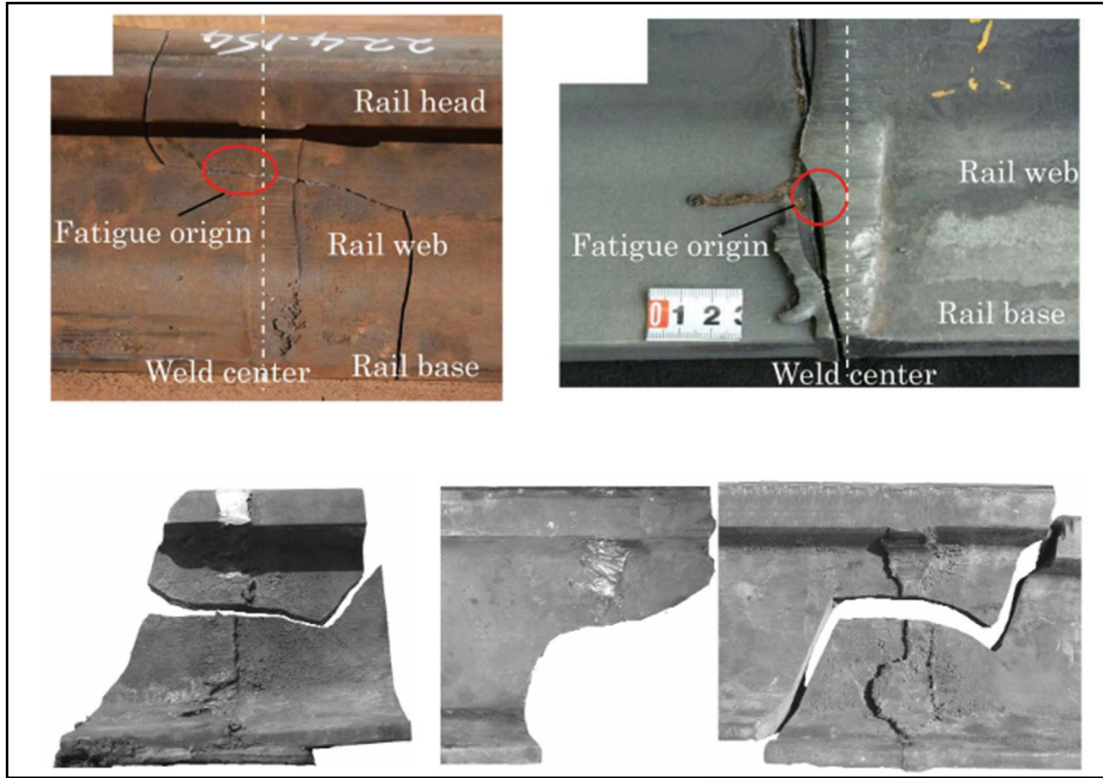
Fatigue cracking in flash-butt welds [33]
